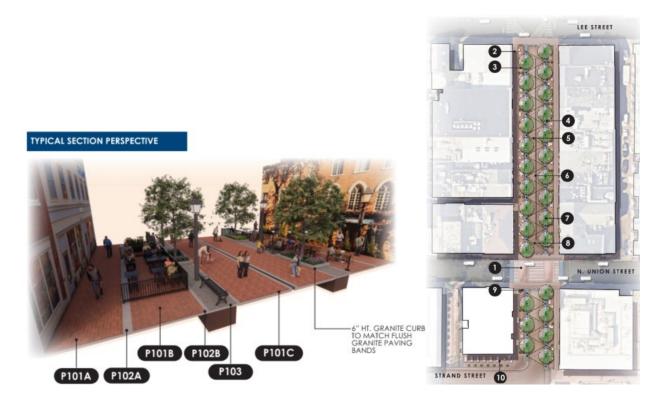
Proposed streetscape for the unit and 100 block of King Street
